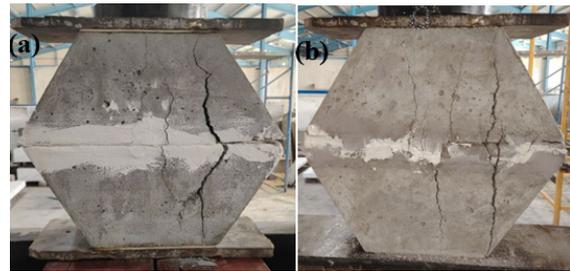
Failure mode for stacked hexagonal blocks (a) without interlocking, (b) with interlocking.
